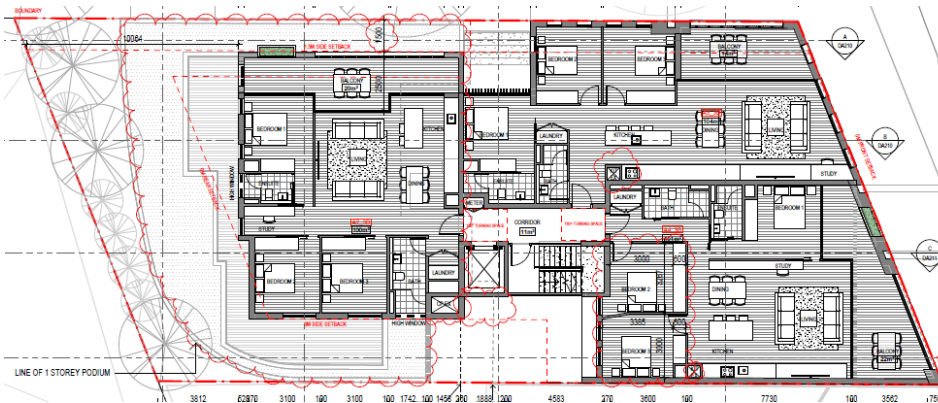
First revision of level 2 floor plan under the subject DA - 18-20A Perouse Road, Randwick
